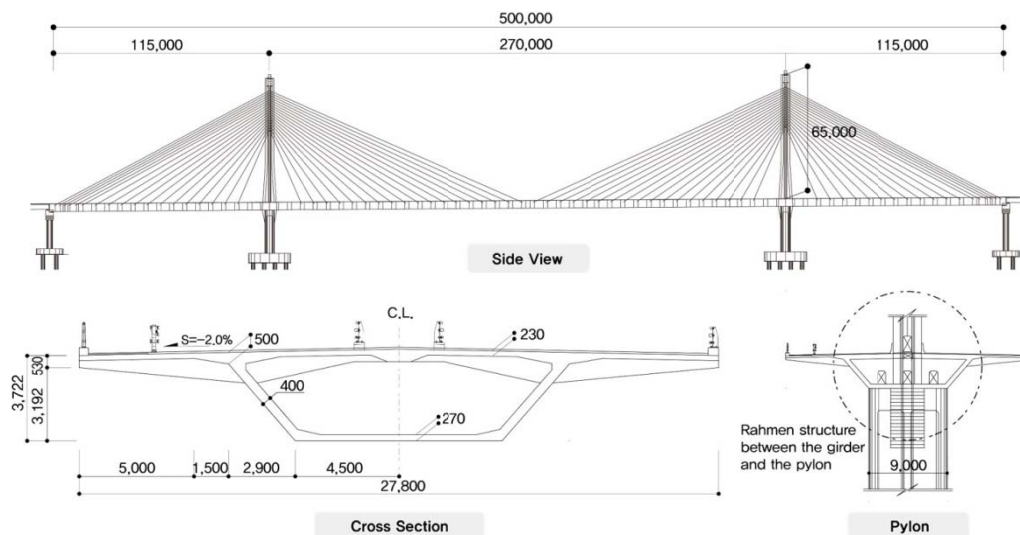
Geometry of Hwamyung cable-stayed bridge (unit: mm)
